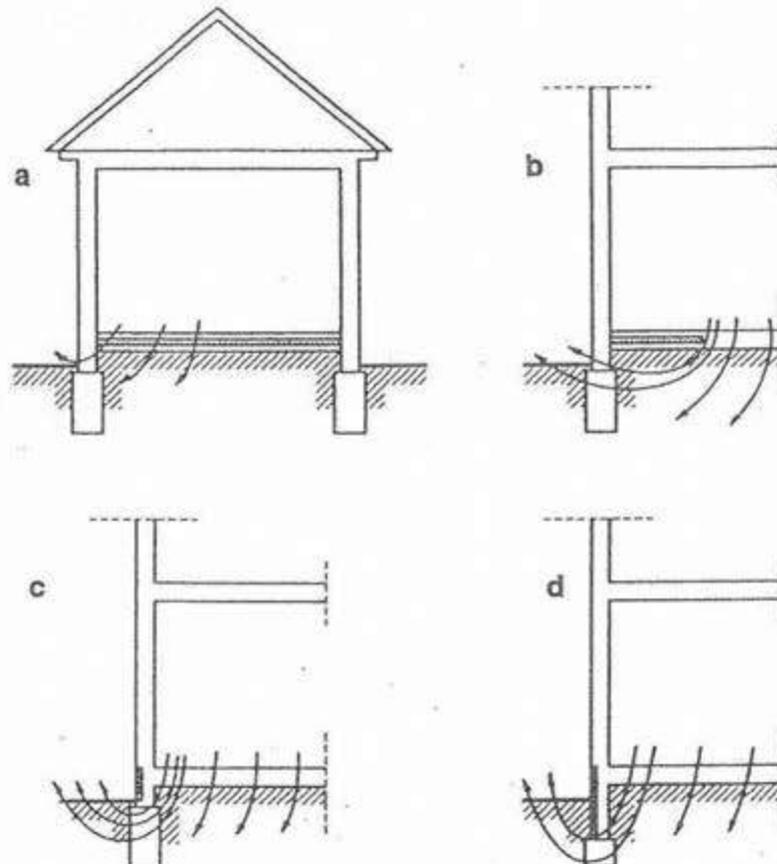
Floor insulation: (a) over the whole area, (b) along the perimeter, horizontally, (c) on foundation wall vertically or (d) extended below ground level.
